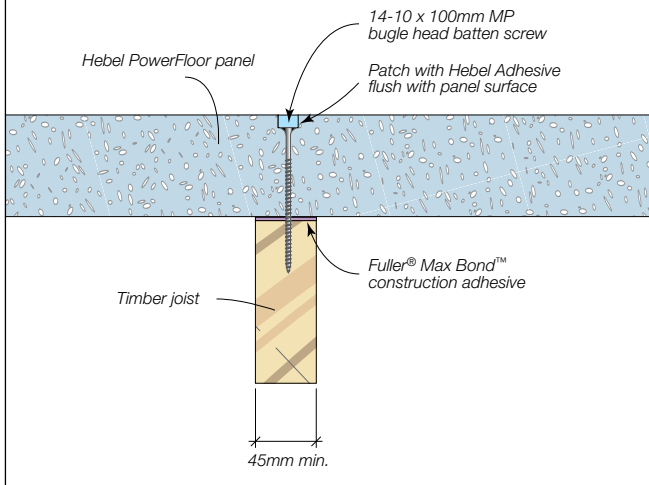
Fixing at End of Hebel PowerFloor Panel to Timber Joists
